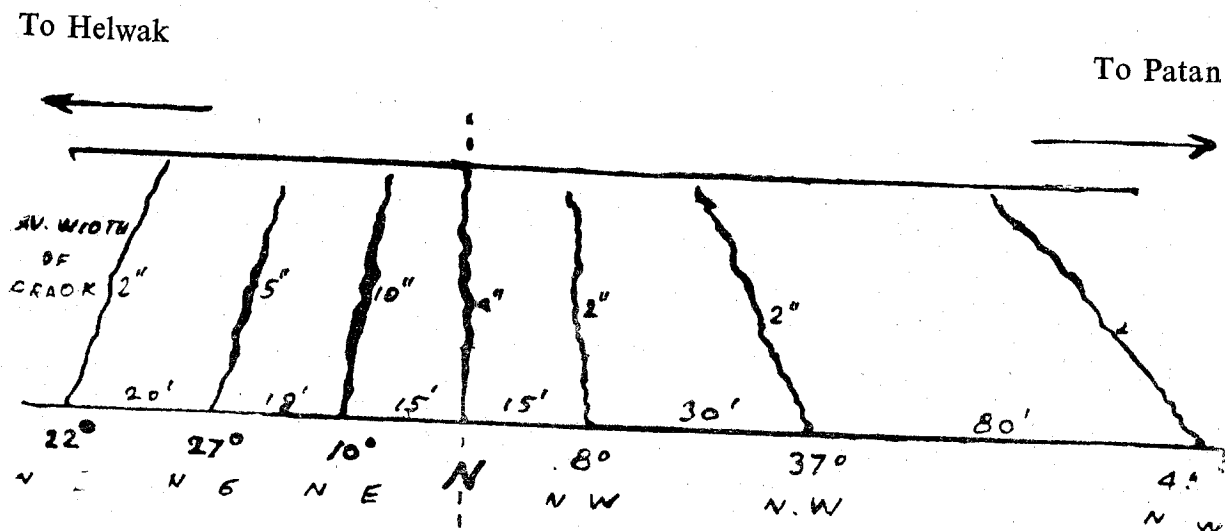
Radial Cracks on Guhagar Karad Road at Mile 55/1.
